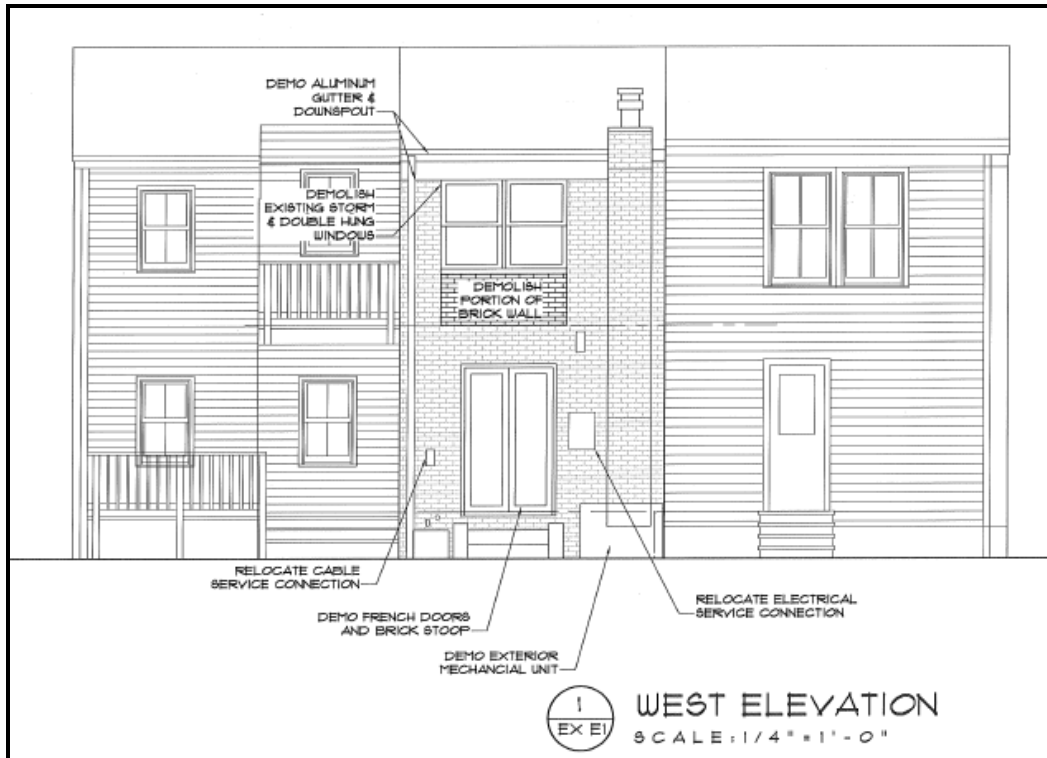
Drawing illustrating area of proposed demolition on existing rear elevation.
